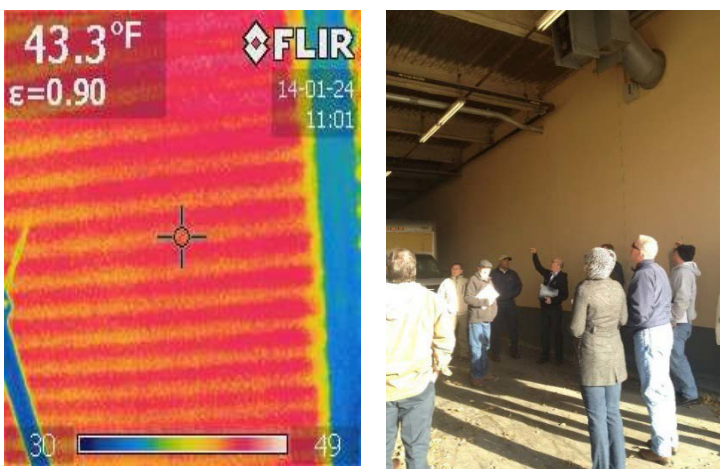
A thermal imaging camera is used to examine the loading dock ceiling
